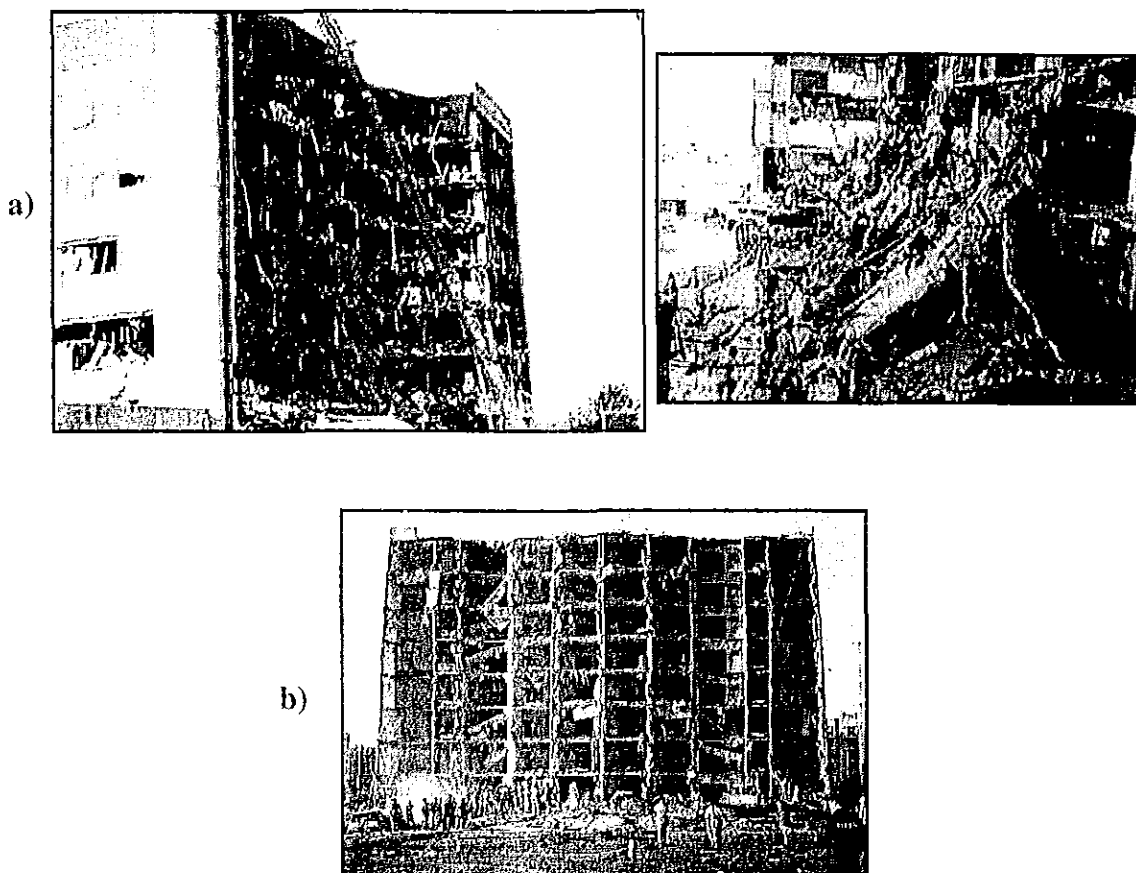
Terrorist attacks on U.S. infrastructure. a) Domestic terrorist attack on the Murrah Building, Oklahoma City resulting in progressive collapse; b) terrorist attack on the Khobar Tower Building, Saudi Arabia, resulting in extensive cladding destruction.
